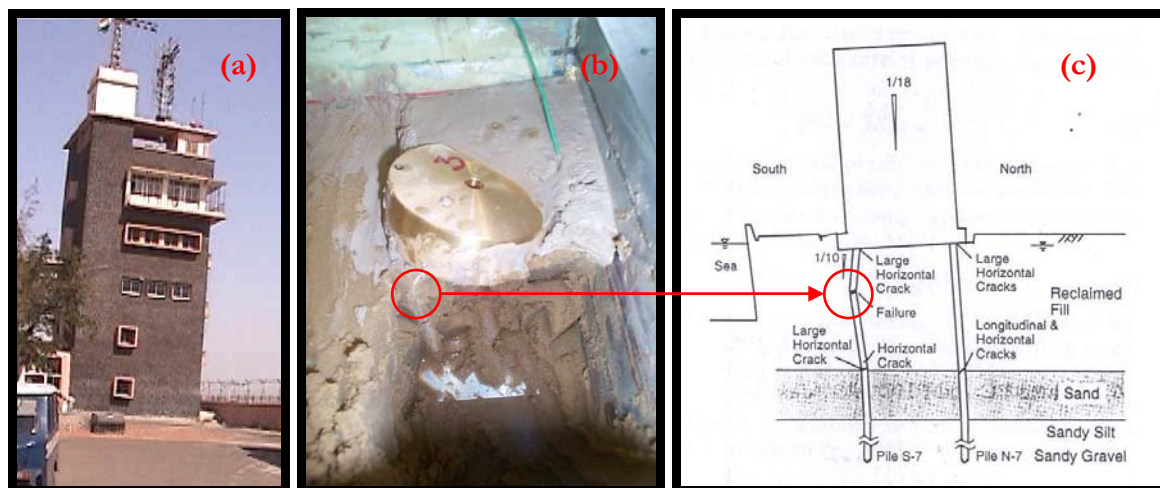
(a): Observed failure of a piled foundation (Kandla Port tower) in 2001 Bhuj earthquake, Madabhushi et al. (2001); (b): Pile (marked 3) failure in centrifuge test SB-02; (c): Excavated piles in a 3 storied building in 1995 Kobe earthquake, Tokimatsu et al., (1997).
